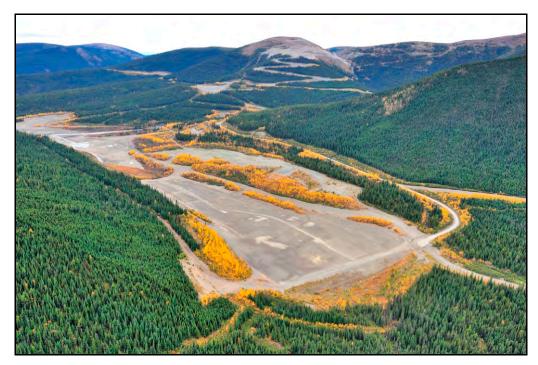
Helicopter view of reclaimed and capped Jewelbox waste rock dump, Jewelbox Open Pit area, and upper Jewelbox switchback (September 15).
